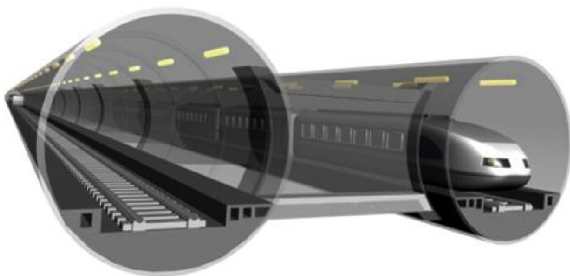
A possible conformation for the Qiongzhou Strait–Crossing Tunnel: a railway tunnel consisting of twin single-track tubes.
